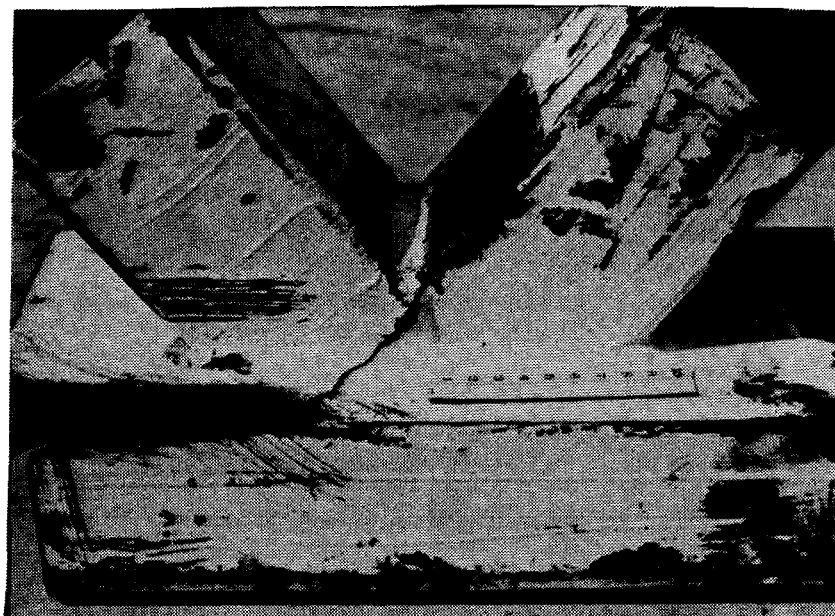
Fatigue Crack in Joint L1 (T7F)
